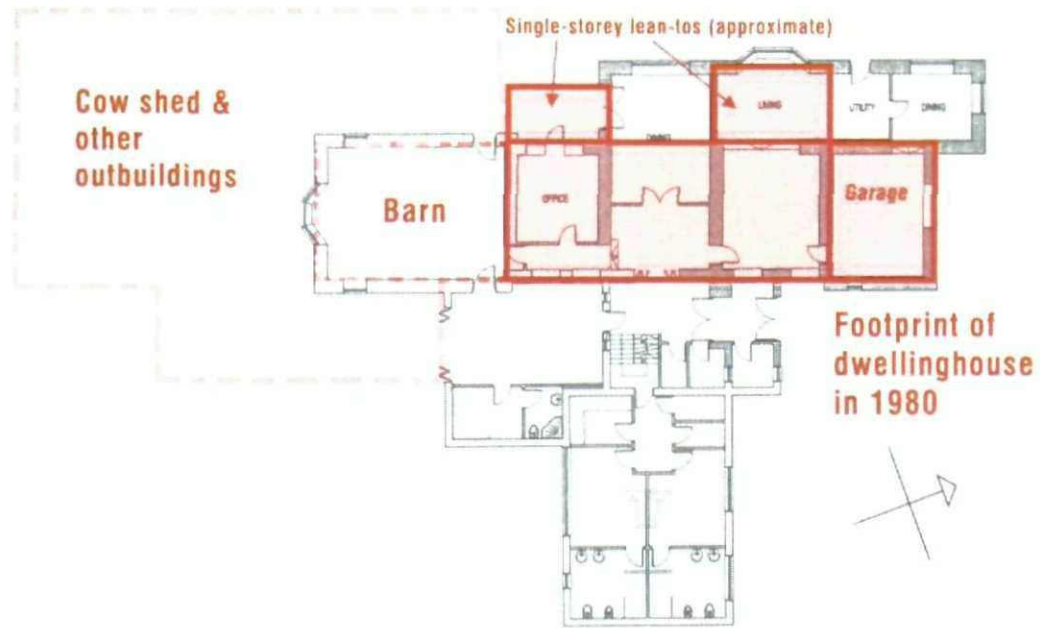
Footprint of dwellinghouse in 1980 overlaid over existing ground floor plan
